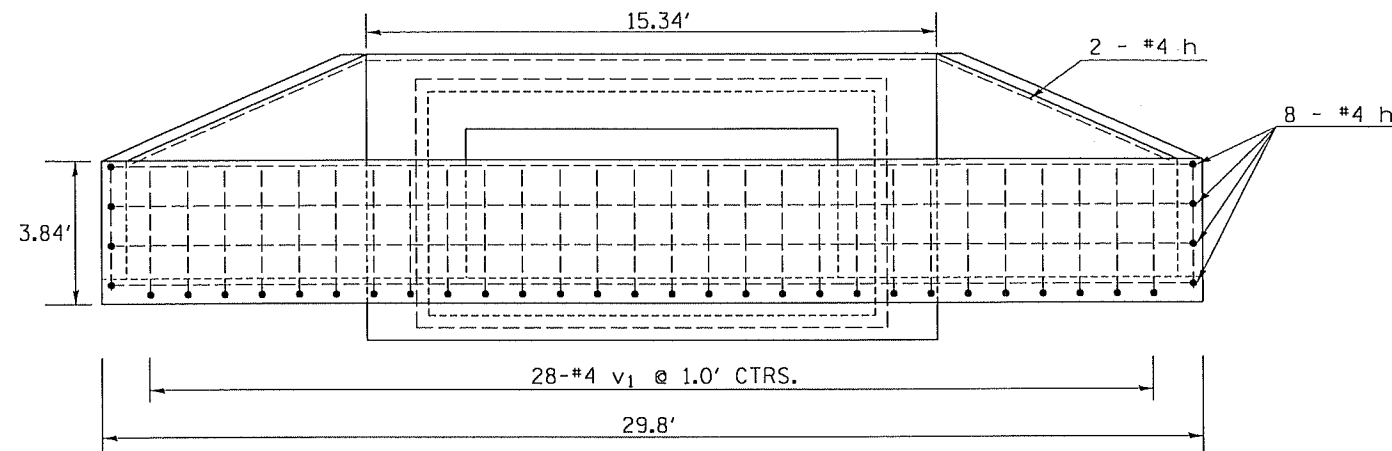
DETAIL OF BOX CULVERT END SECTION STA. 824+77-34' RT. (UPSTREAM SIDE)
